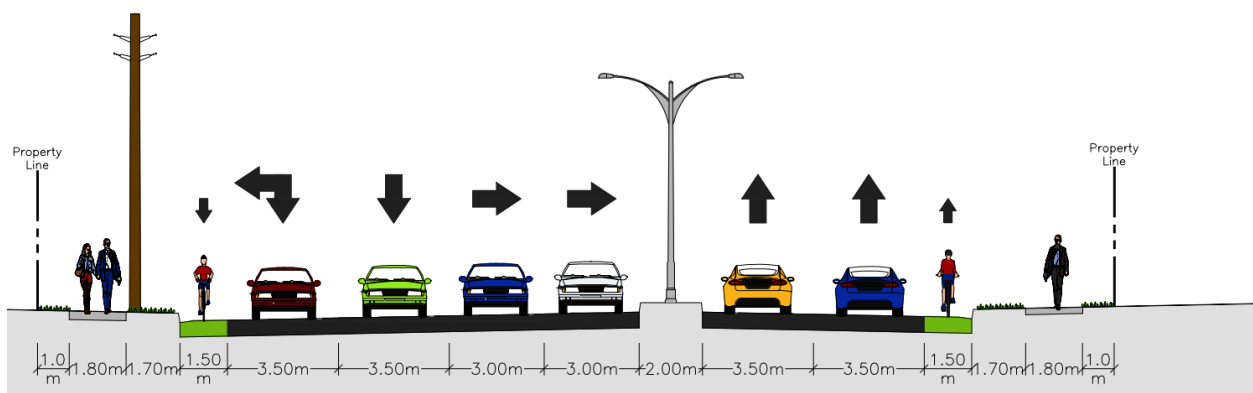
Preferred Design, Hamilton Road Cross-Section, East of Highbury Avenue North
